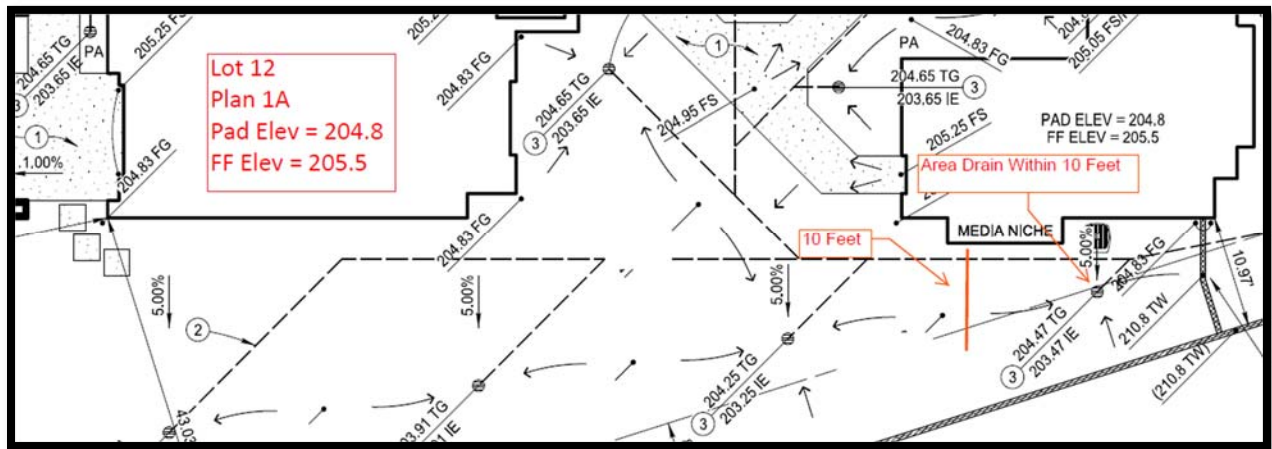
Example of Area Drains Used Within 10 Feet of Foundations When Slope < 5% in 10 Feet.
